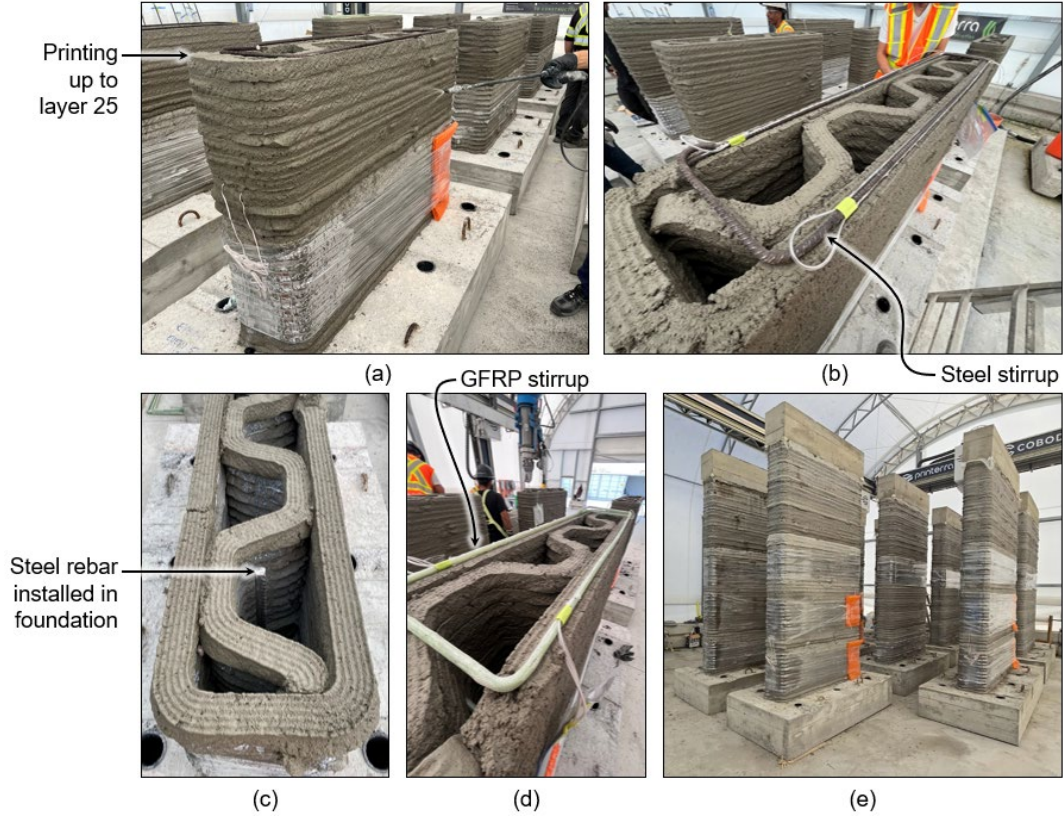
Shear wall fabrication sequence: (a) completion of printing up to approximately layer 30, (b) typical placement of a steel stirrup (subsequently spaced at 200 mm on centre), (c) typical installation of the vertical steel reinforcing bar, (d) typical placement of a GFRP stirrup, (e) completed shear wall specimens after printing and casting reinforced concrete cap beam.
